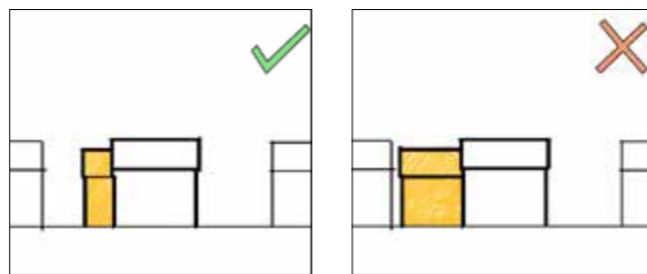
How to ensure that extensions reflect the patterns of spacings between dwellings
